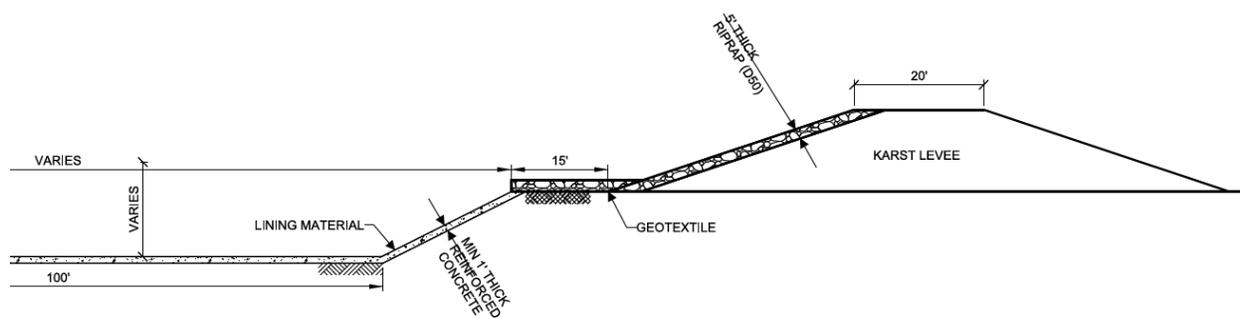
Alternative 3 Cross Section (shown with single line of protection)
